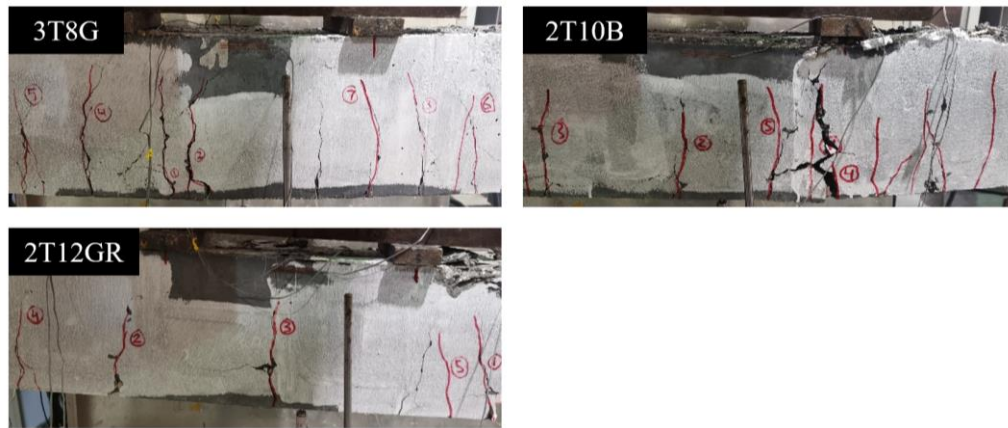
Failure modes and cracking patterns of under-reinforced beams.
